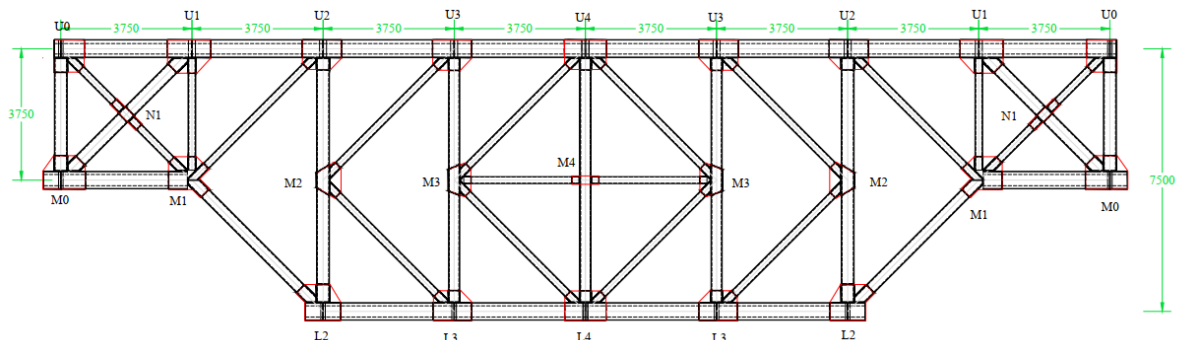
Kotibhel bridge [GAD, 30m steel truss, kotibhel bridge].
